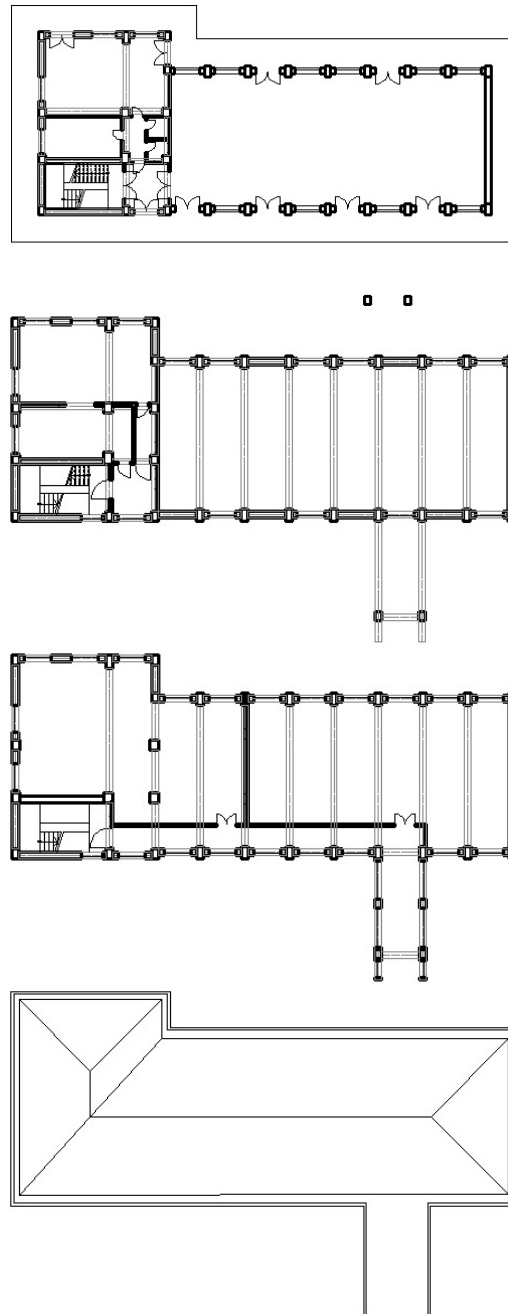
Auditorium ITI Monaco: ground floor, 1th floor, 2nd floor, roof floor
